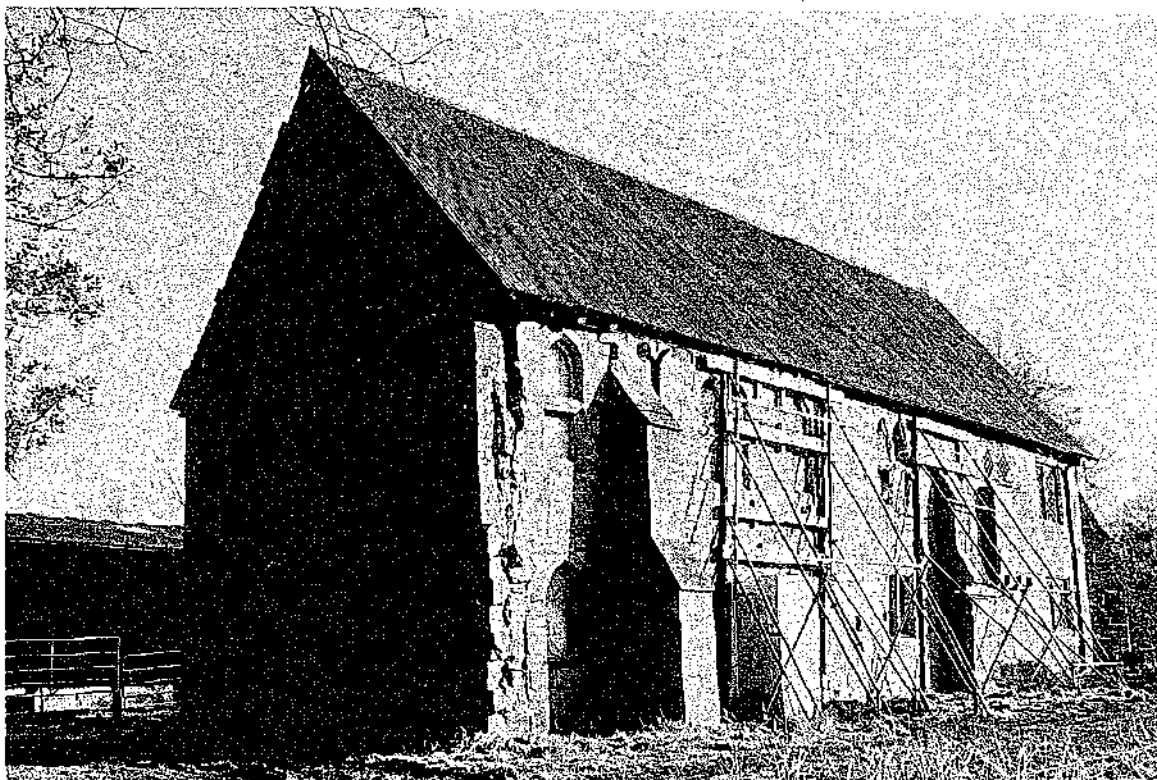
Structure 1, view of the south wall looking north-east (Sterenbergh).
